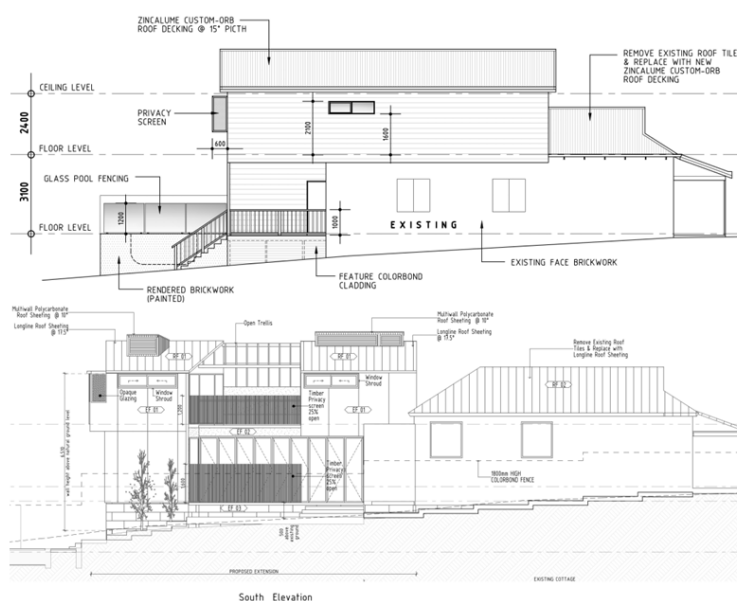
Comparison of originally submitted plans (south elevation) under application ref. DA0100/22 (top plan) and the amended plans (south elevation) that were approved by Council (bottom plan), noting the 'open trellis' (pergola) above the first floor terrace, centrally located in the upper floor of the rear addition.
